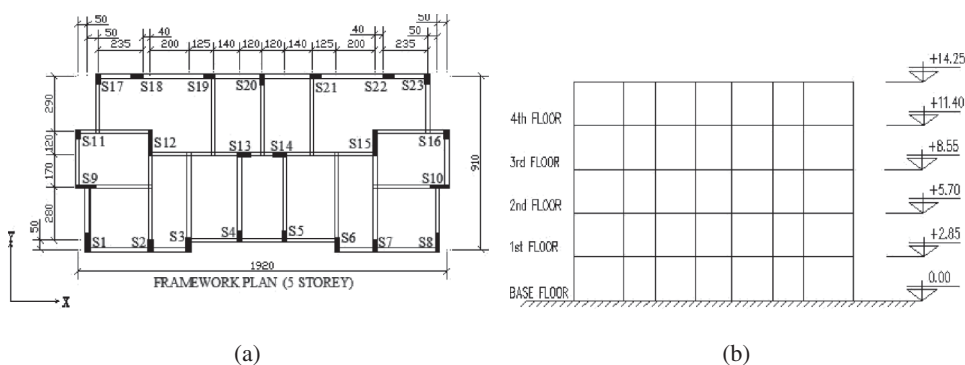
(a) Plan view (cm); (b) lateral view (m).
